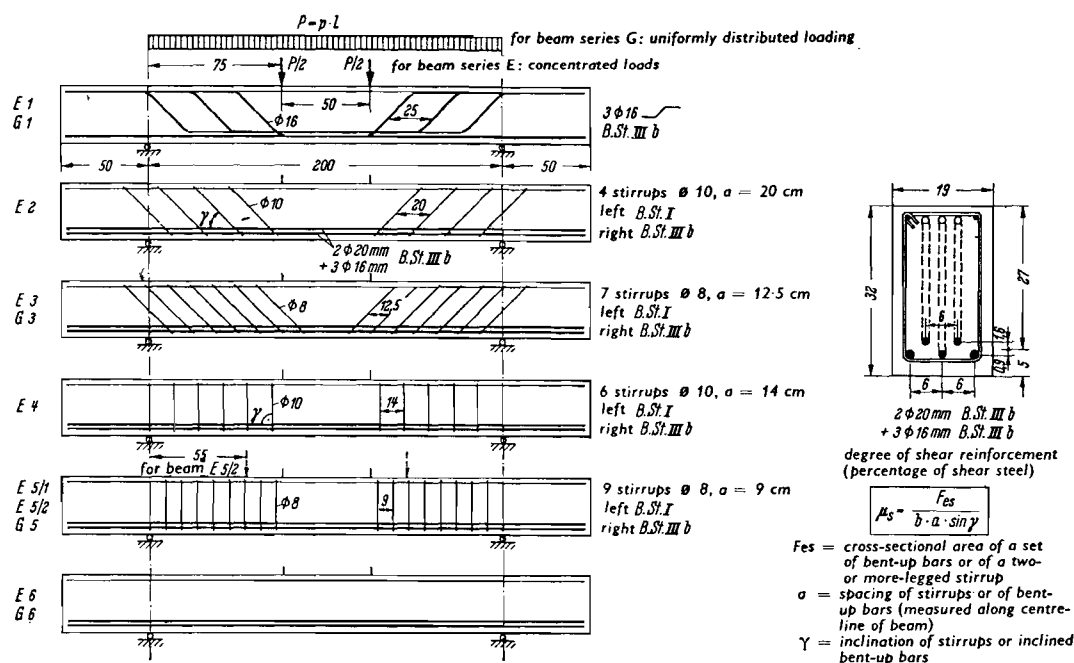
Dimensions and reinforcement of the beams with varying shear reinforcement.
